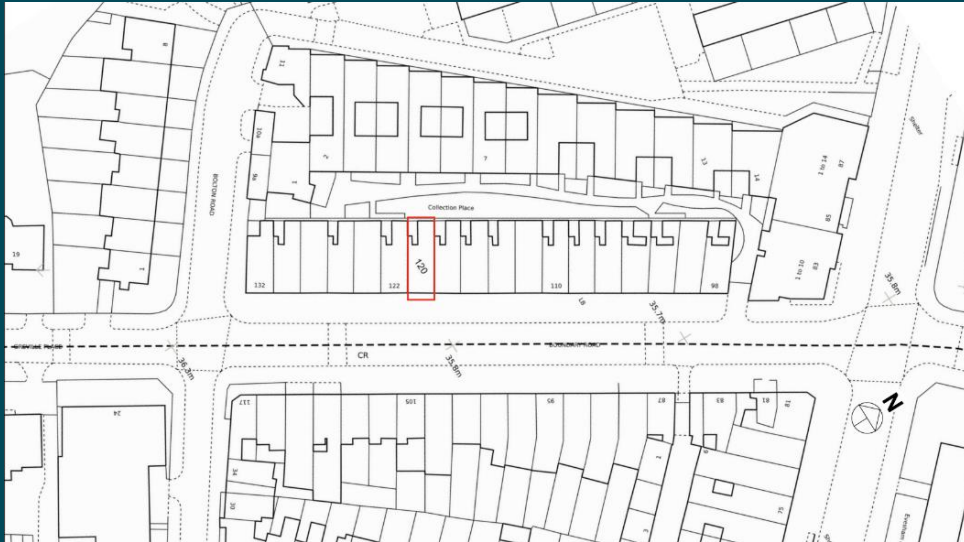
Existing and Proposed Block Plan. (Not to scale please see supporting planning drawings).
